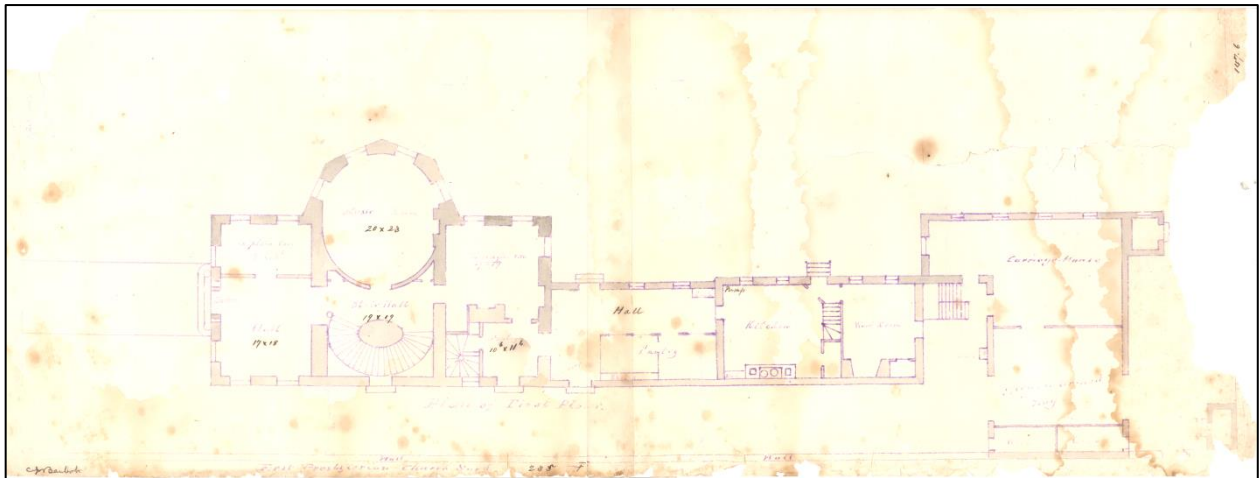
1870 plat of the Nathaniel Russell House. Collections of Historic Charleston Foundation.
